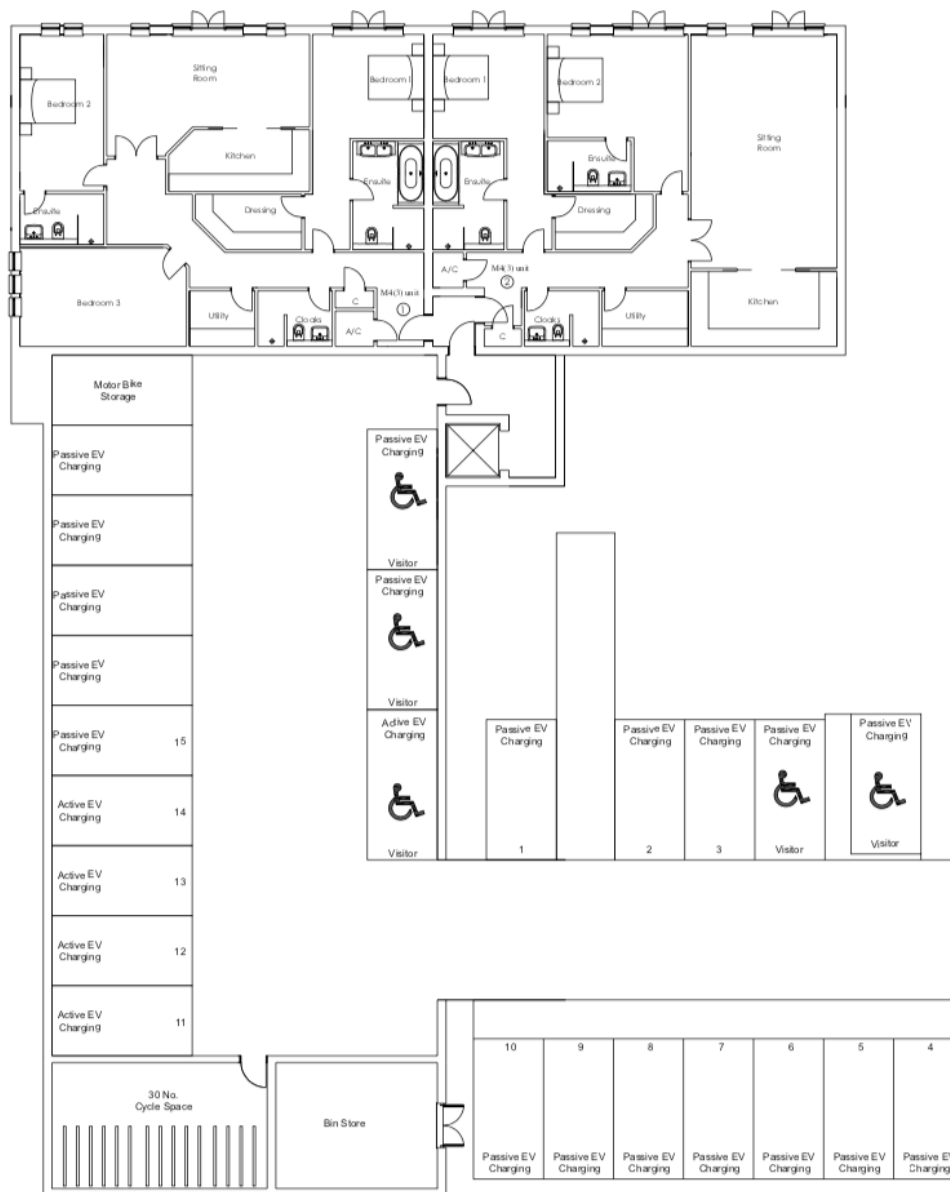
Parking allocation plan (Basement and Ground Floor Plan)
